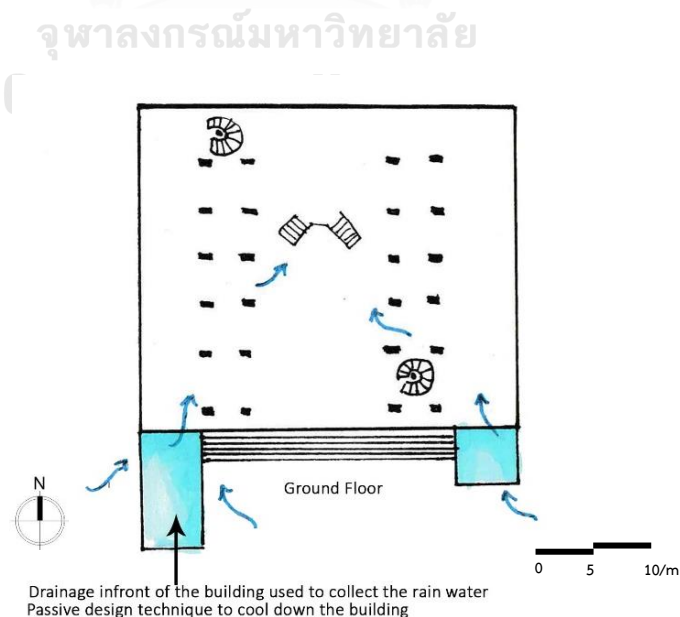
4 Diagram drawing analysis ground floor plan of SKD Brewery office
